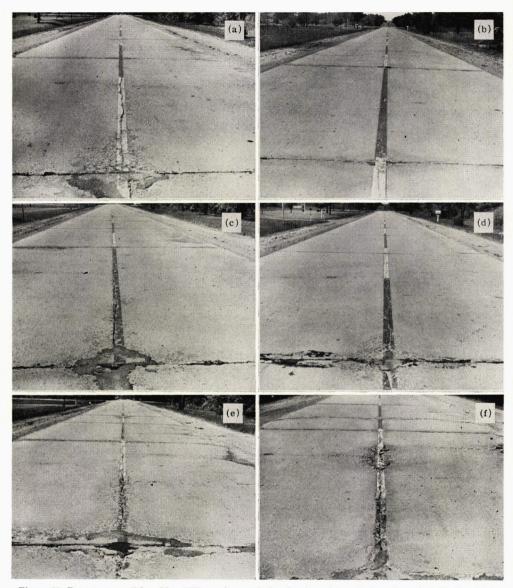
Pavement condition, May 1957; curing methods, showing: (a) wetted earth curing, Section 3A-4, Sta. 398+10; (b) asphalt emulsion curing, Section 3A-1, Sta. 394+50; (c) ponding, Section 3A-5, Sta. 399+30; (d) paper with initial burlap, Section 3A-3, Sta. 396+90; (e) double burlap, Section 3A-6, Sta. 400+50; (f) transparent membrane, Section 3A-9, Sta. 404+10.
